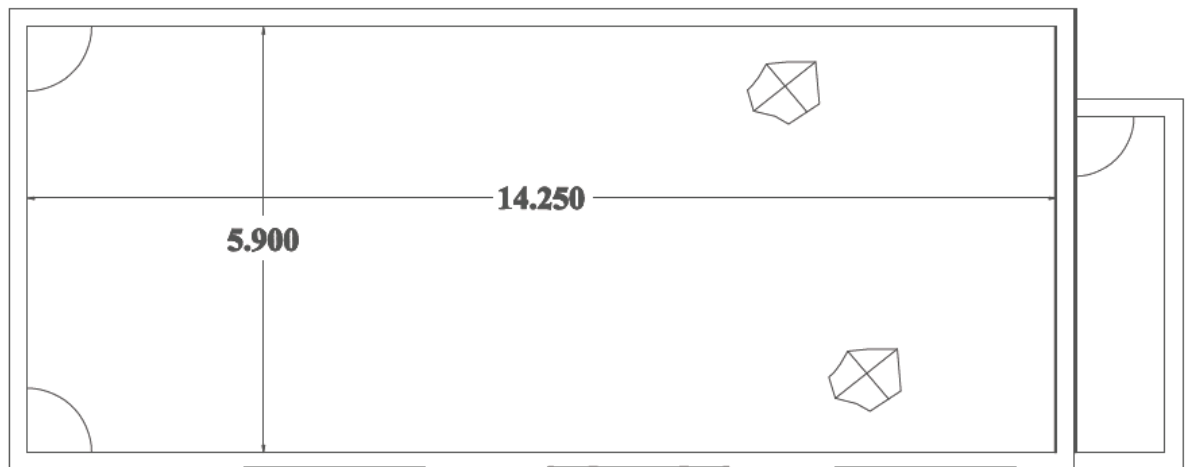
General Plan of the Main Hall Showing the Location of the Rocket Strike.
